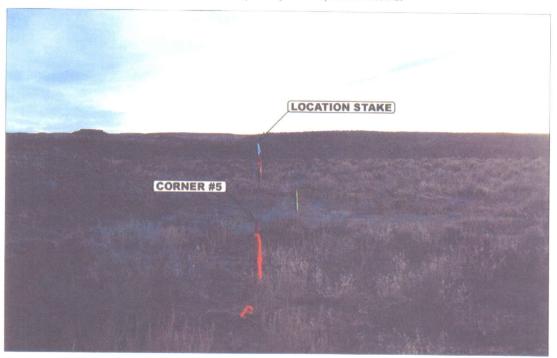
PHOTO: VIEW FROM CORNER #5 TO LOCATION STAKE
